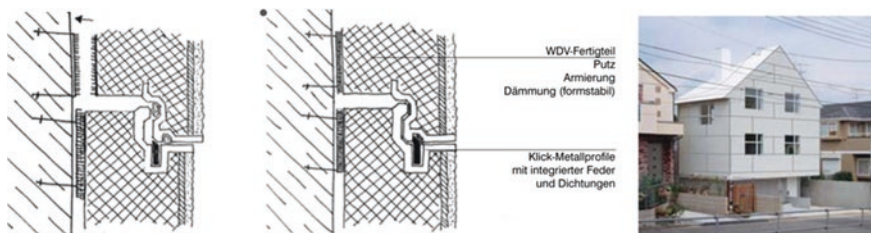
Prefabricated click-insulation facade module with reclosable fastener fixation [3]
